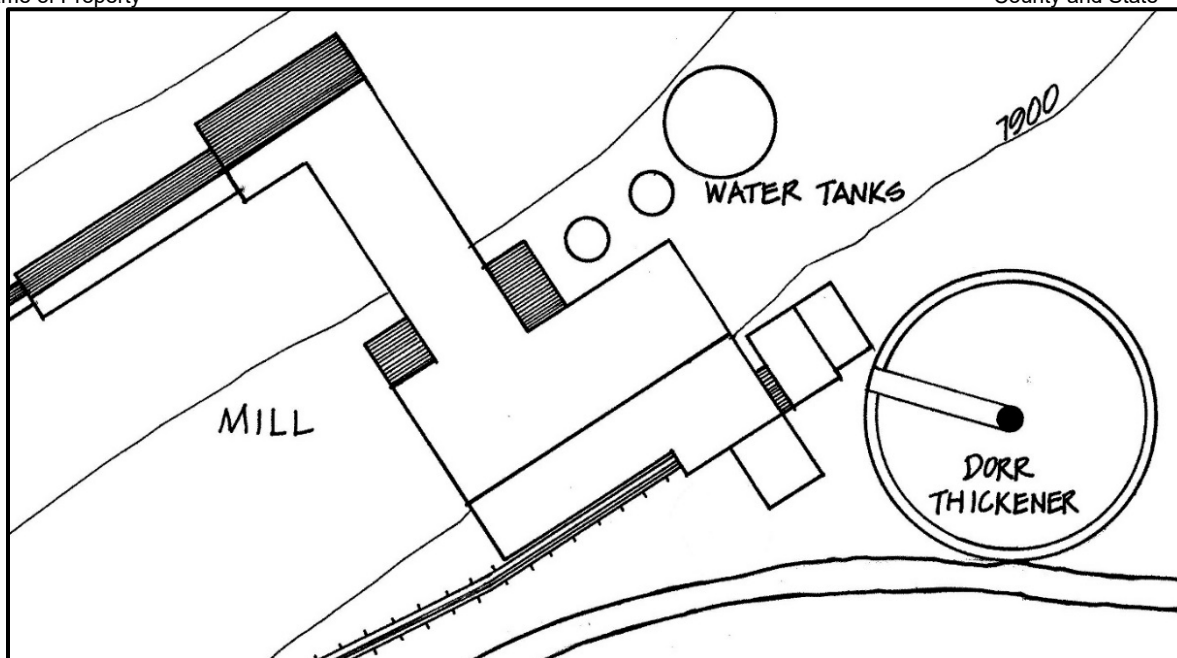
Silver King Coalition Mill building, detail redrawn from HAER UT-22, 1972.
